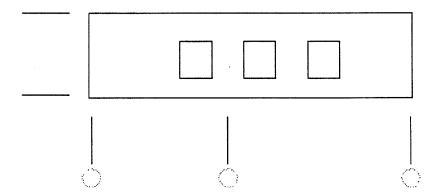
Simplified Elevation Drawing. AutoMOD interpretes walls and windows in an elevation drawing. Light color lines are ignored in interpretation.
